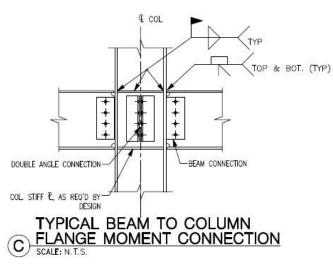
Typical Moment Connection Drawings Courtesy of JCJ Architecture
